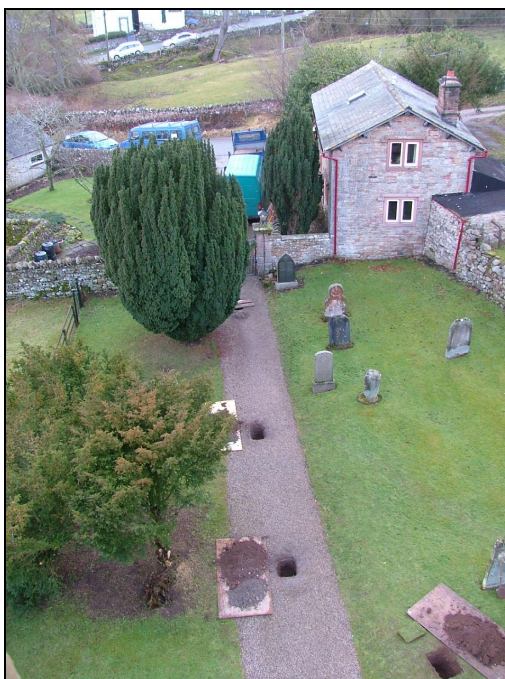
View from the church tower looking west showing the locations of the test pits along the churchyard path
